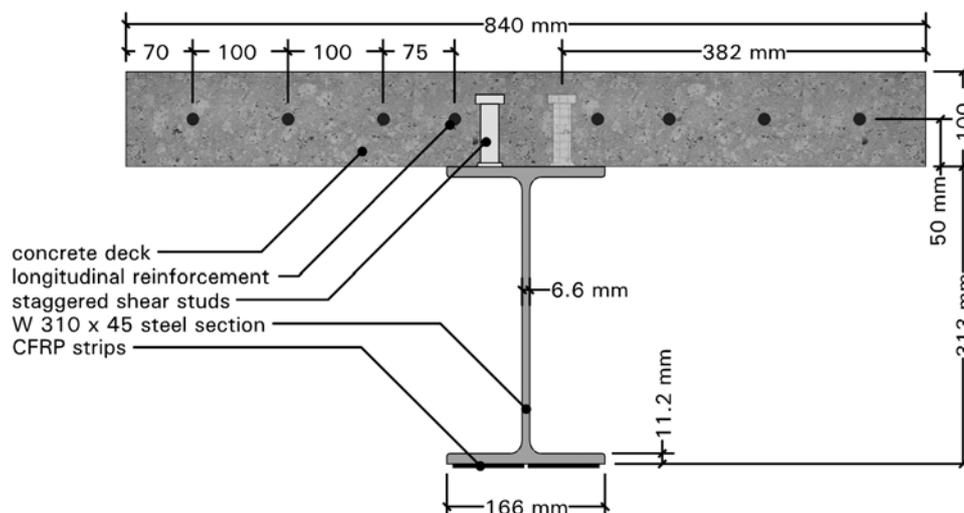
Cross-section dimensions for large-scale steel-concrete composite beams
